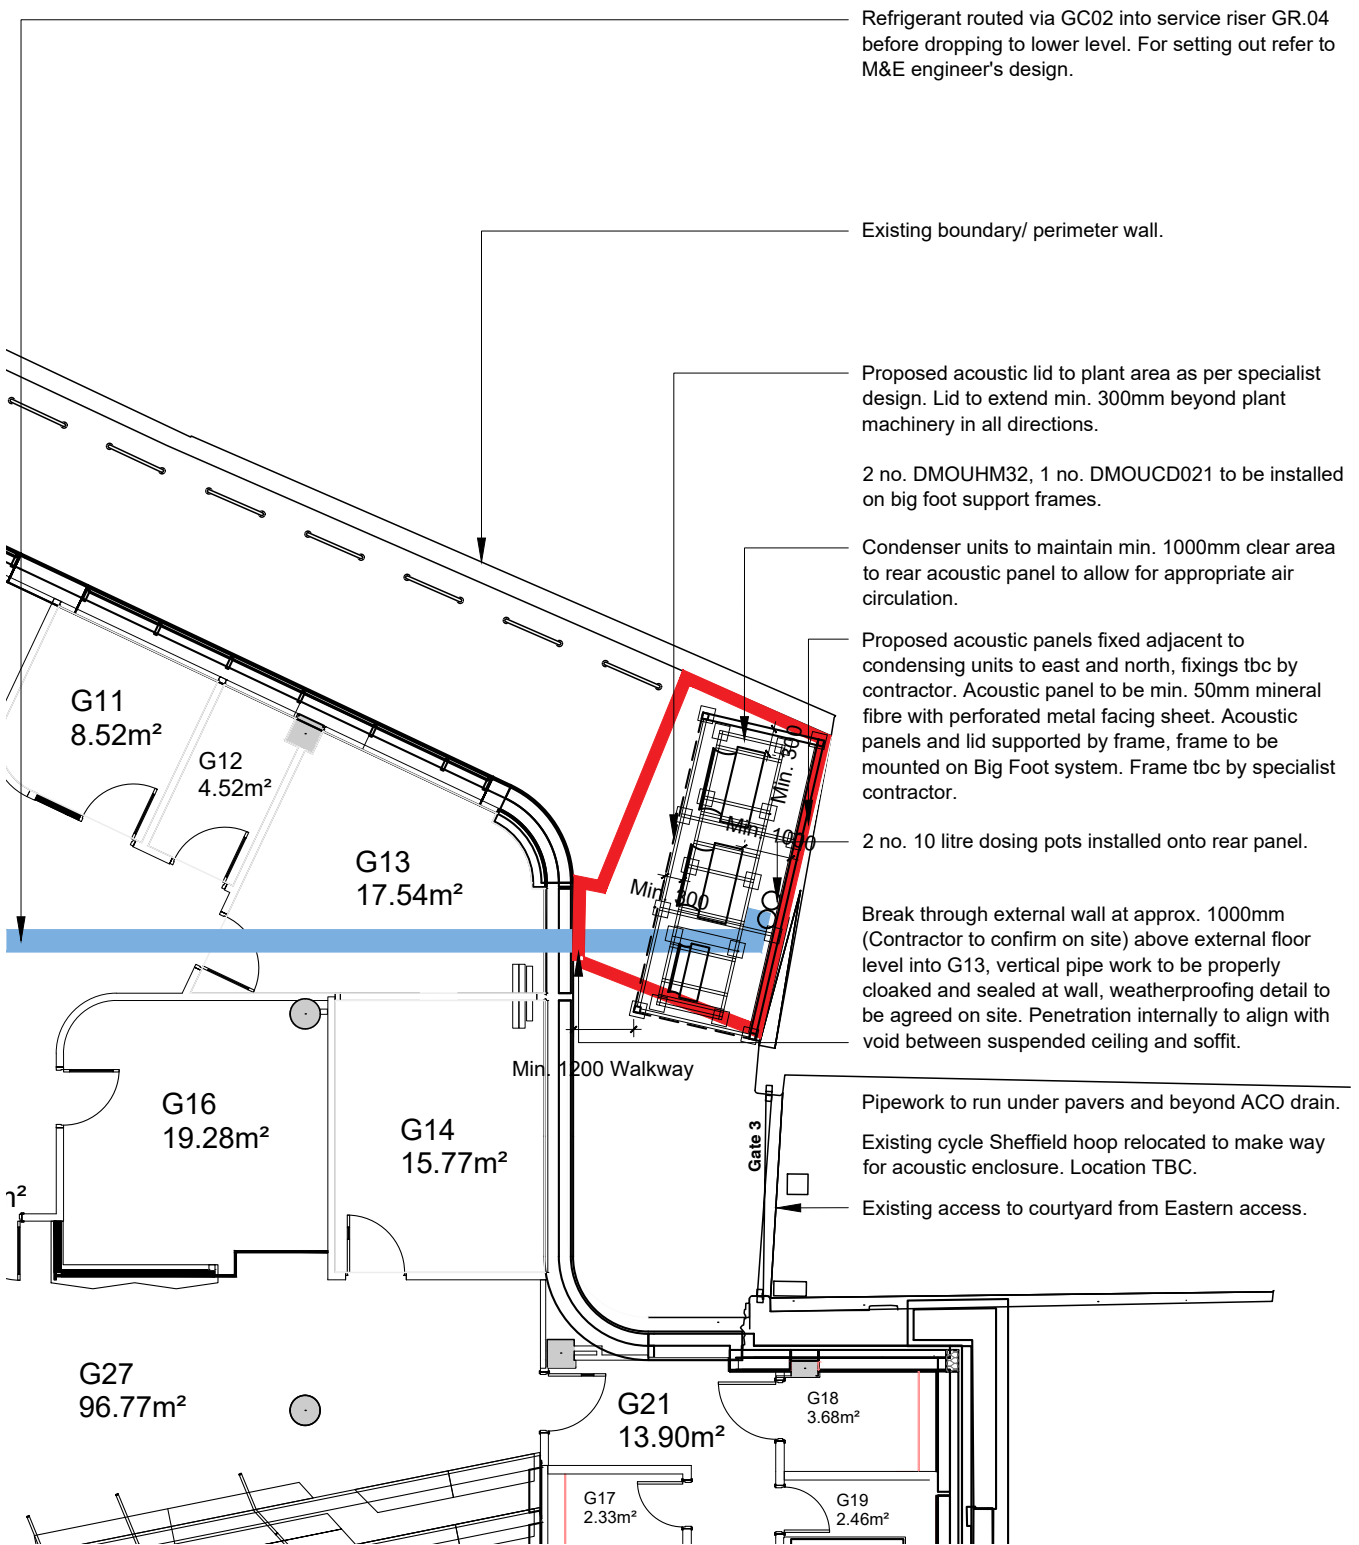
Ground floor plan (not to scale) showing the external access/courtyard area in which the condensers are proposed.
